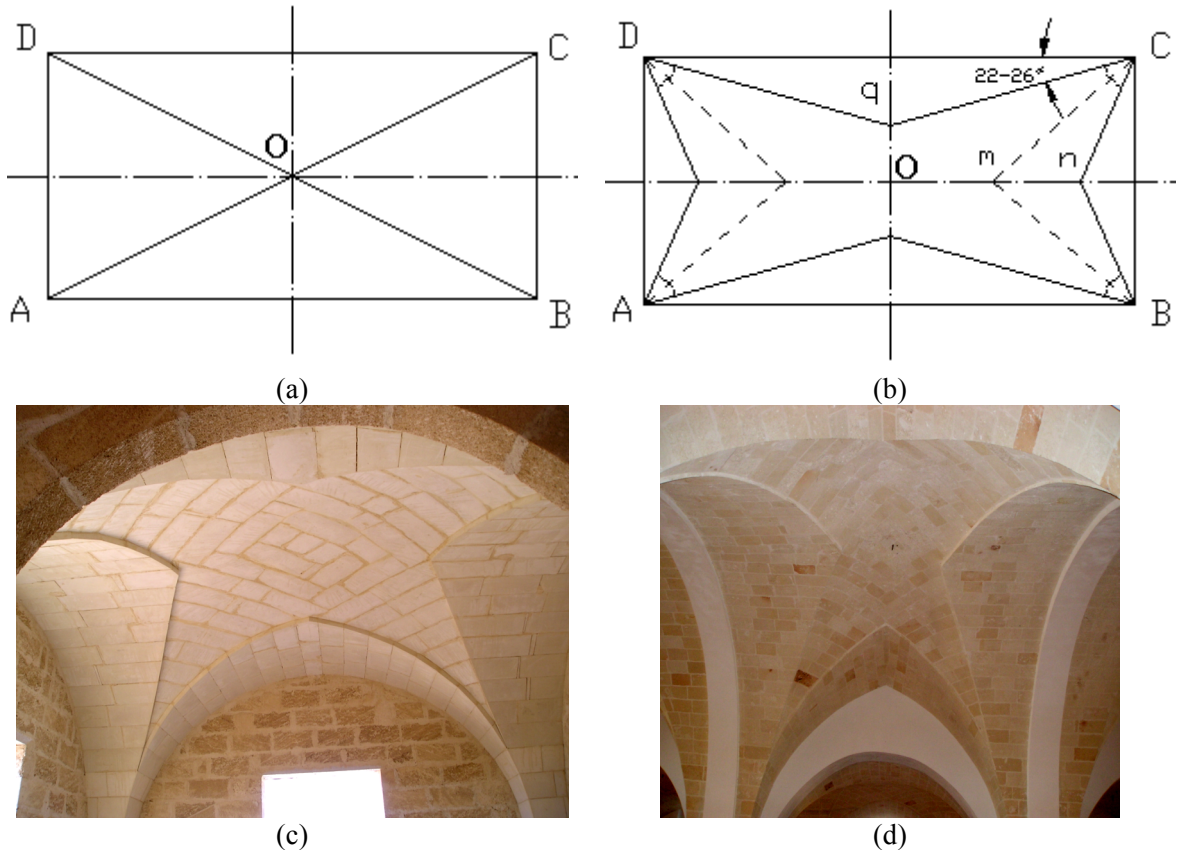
Geometry of edge vaults. (a) Plan of a cross-vault. (b) Plan of an edge vault. (c) An example of edge vault over square plan with semicircular webs. (d) An example of edge vault over rectangular plan with semicircular (long sides) and pointed (short sides) webs.
